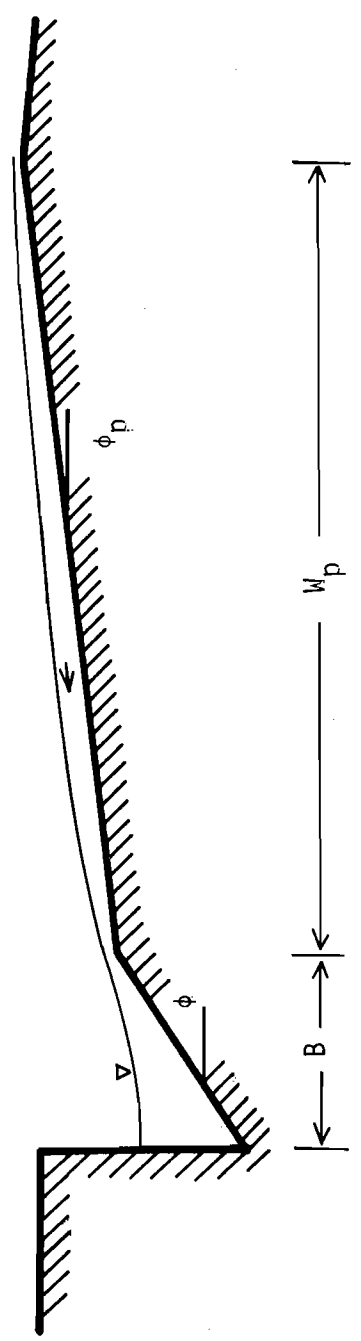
CROSS SECTION OF GUTTER AND PAVEMENT
